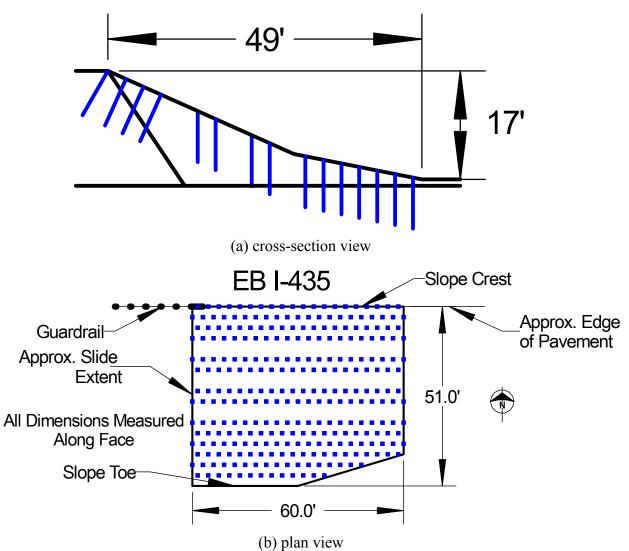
Selected stabilization scheme for the I435-Holmes Road site: (a) cross-section and (b) plan view.
